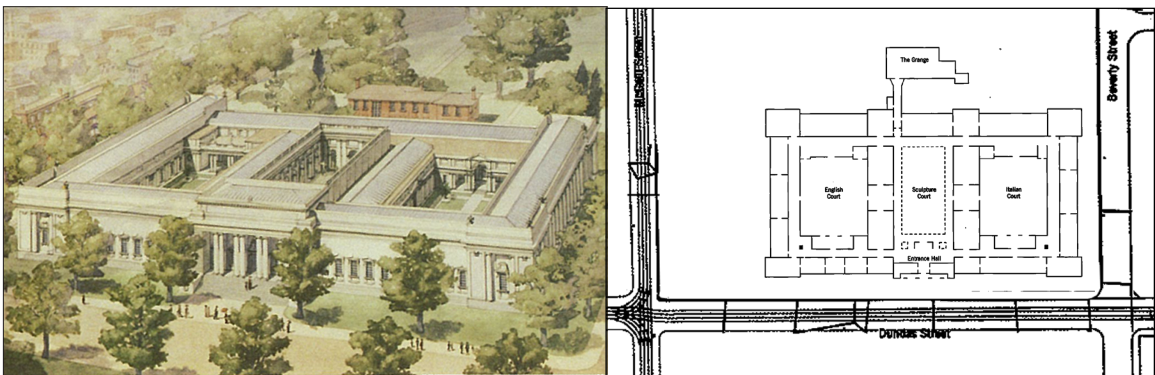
While never built, because of economic issues. The floor plan and street layout were combined to show the relationship of the Art Gallery of Ontario and the roads have been imposed over the floor plan. However this design was never realized. (Image Source: Frank Gehry Toronto)
